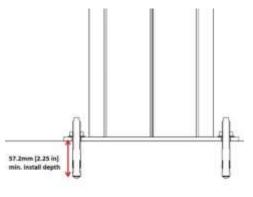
Wedge anchors secure Pedestal when installed in concrete 2.25 inches
